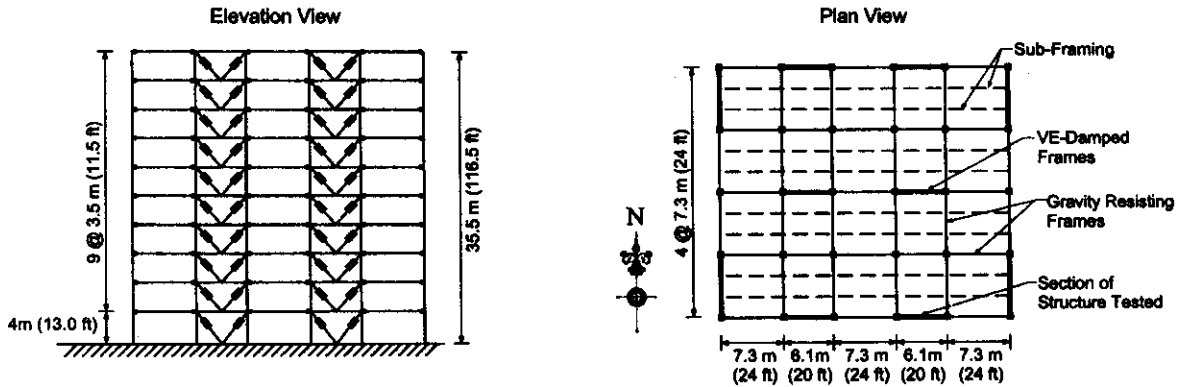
Plan and elevation view of multi-story prototype viscoelastically damped steel frame.
